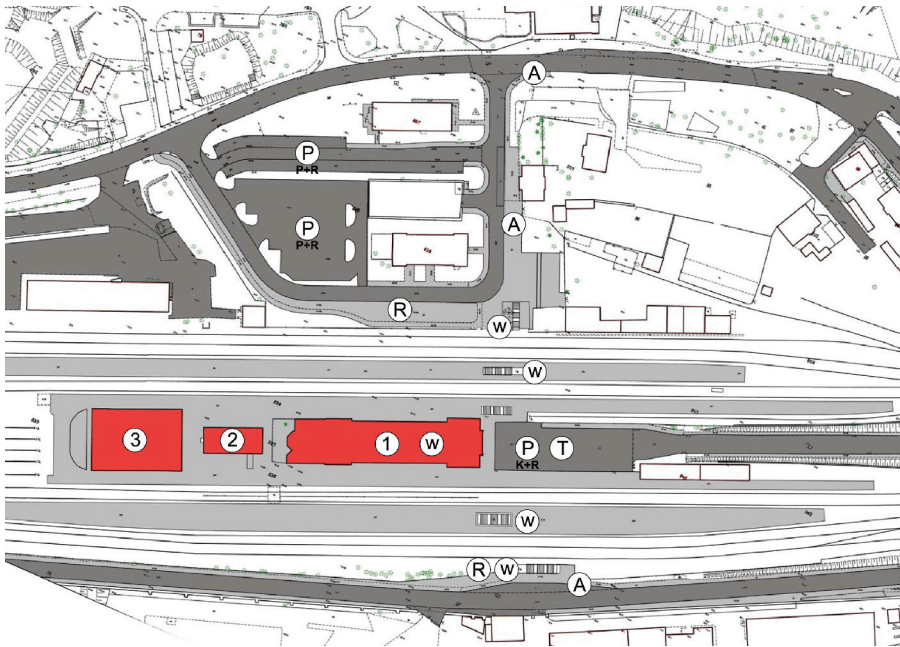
Interchange junction by the Toruń Główny station [developed by author]: Railway station buildings 1–3: 1) Main railway station building, 2) Former telegraph building combined with a toilet, 3) Former post office building; P – park and ride P+R car park, K+R kiss and ride car park; R – bicycle parking; A – public transportation stops, T – taxi rank, W – disabled lifts
